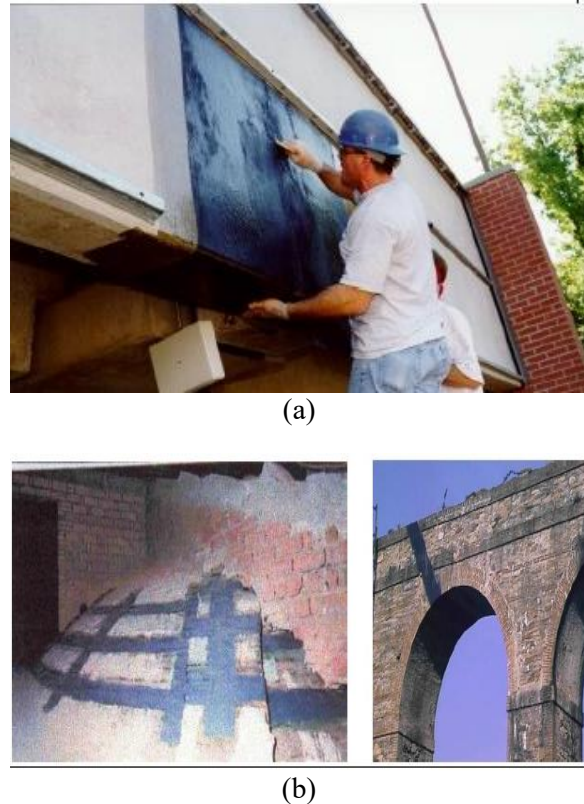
(a) Typical FRP application. (b) Examples of strengthening of historical & modern masonry with FRP [32].
